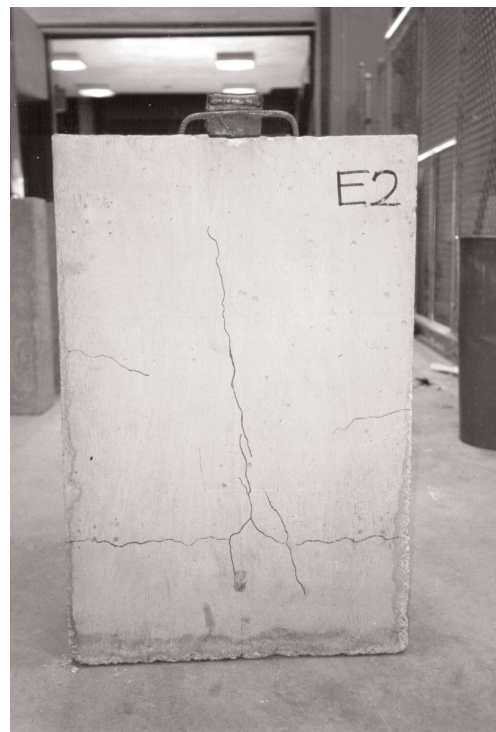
Cracking pattern (specimens with slab reinforcement).
